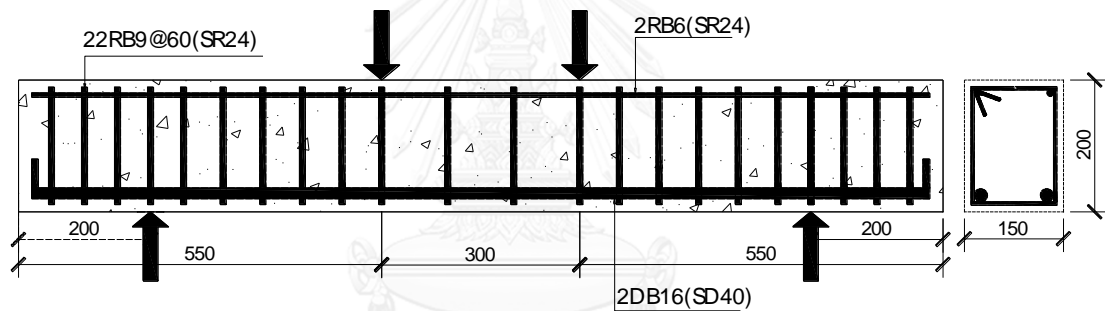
Dimensions and reinforcement details of the beam test specimen
